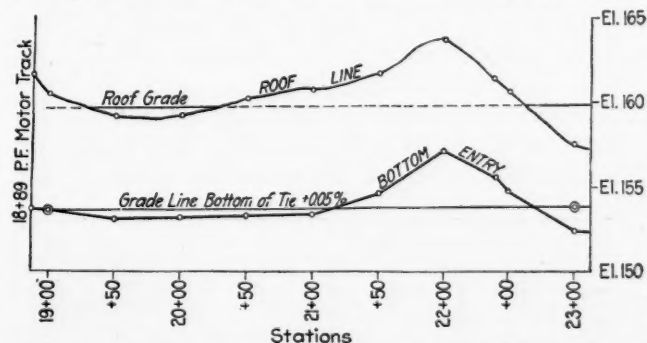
LONGITUDINAL CROSS-SECTION OF HEADING
